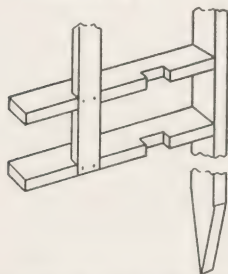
Constructional details, showing how lathes are sunk into the post rail
